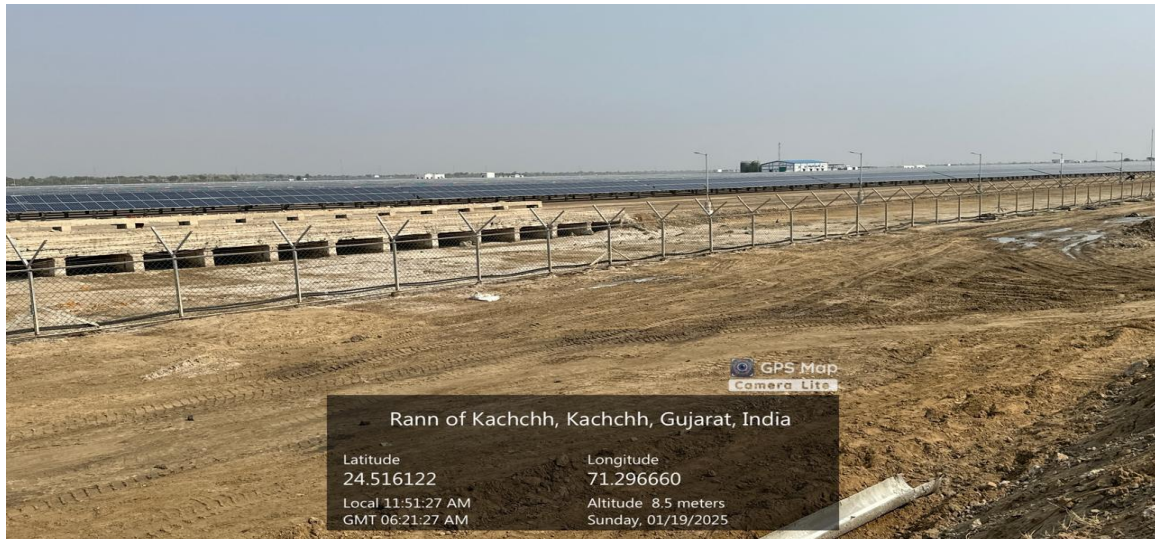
The existing box culvert is on the peripheral road of the Tata solar plant.
